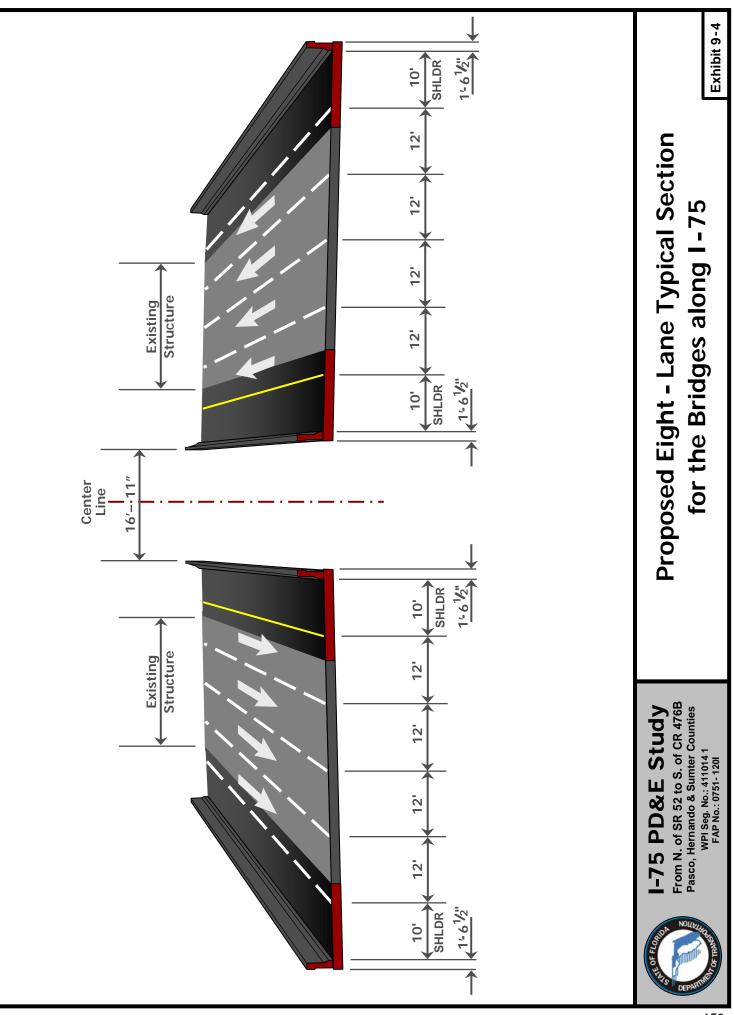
and 9-4 depict the proposed eight-lane typical sections for widening the mainline and bridges, respectively, along I-75 throughout the length of this project. As shown, the proposed typical section includes the construction of one additional lane within the median and one additional lane to the outside where the existing outside shoulder is presently located. As noted in Section 9.1, this widening will be accomplished in two phases, starting with Phase 1 when the two inside lanes will be constructed. Appendix A provides the interim six-lane typical sections. Since the remaining median after the construction of the inside lanes will be for most of the project 40.0 feet wide, 24.0 feet less than the standard minimum median width for this type of facility, guardrail would need to be placed along the median and a design variation will be required. With the construction of the two outside lanes in Phase 2, the border width will also be reduced from 94.0 feet to 82.0 feet which will require an additional design variation.
